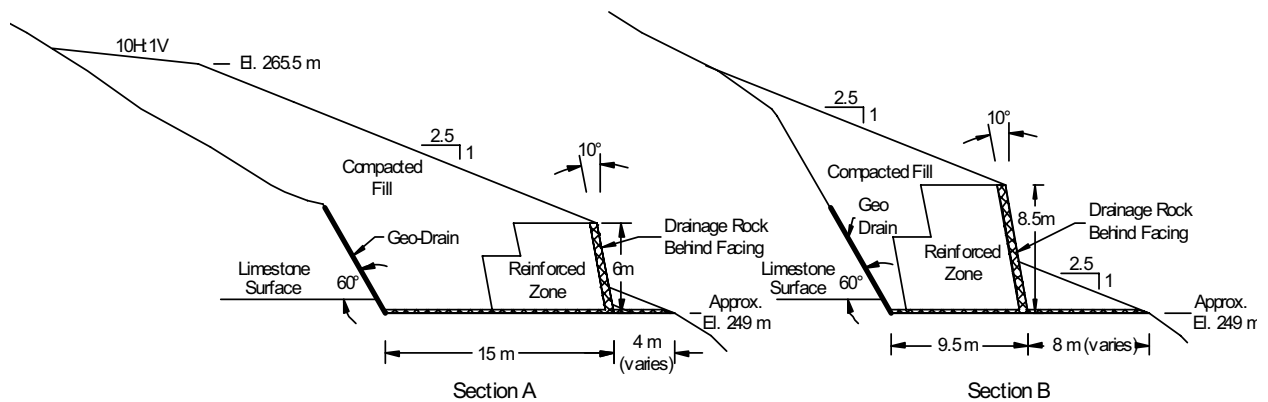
Design Cross Sections – South Slope MSE Wall/Shear Key
